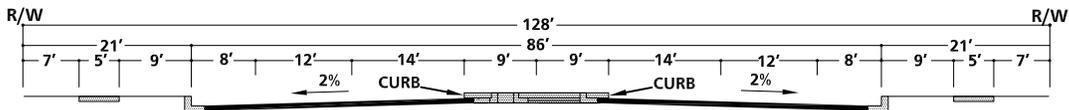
CITY OF EASTVALE GENERAL PLAN ROADWAY CROSS-SECTIONS
